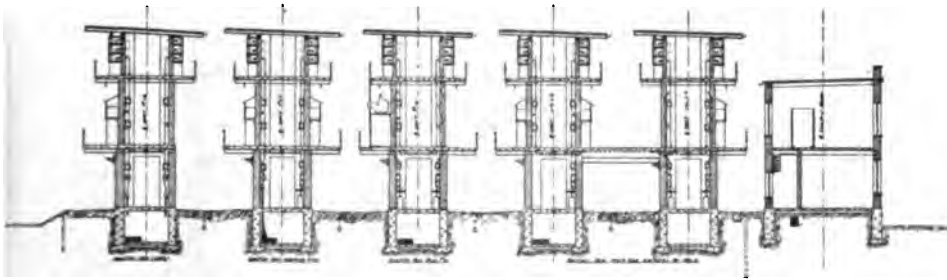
LONGITUDINAL SECTION OF ECHOTA DISTRIBUTING STATION—SHOWING CROSS-SECTIONS OF BUS AND SWITCH STRUCTURES AND CONTROL ROOM
